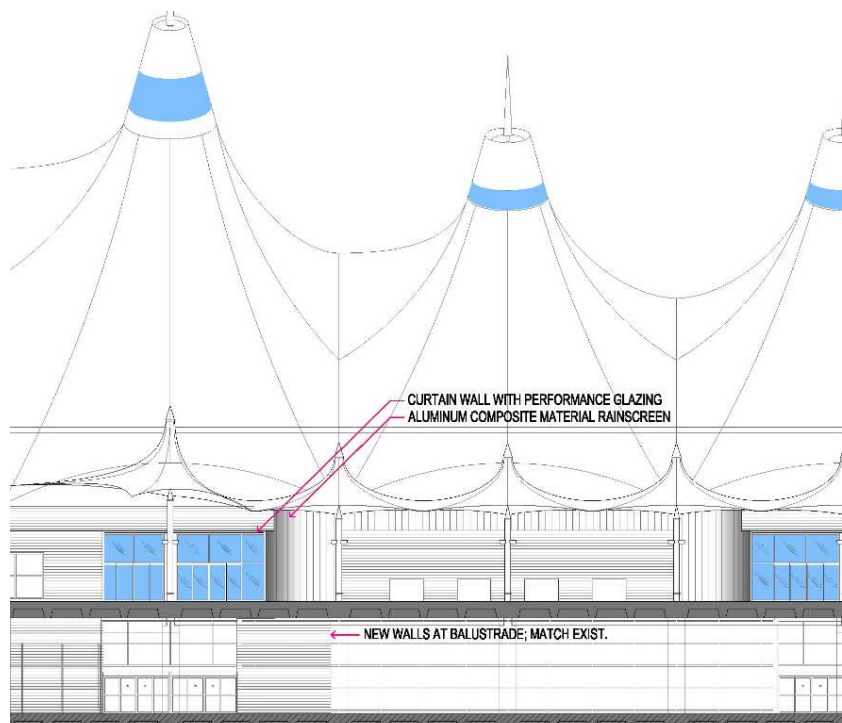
(a) – IECC: Fenestration Values Elevation Typ.
